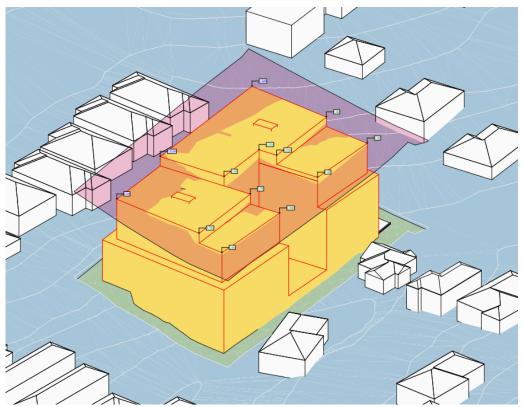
Extract of proposed plans showing the proposed Height Limit Plan. Source: Urbis, 2025, drawing number DA309.1.
